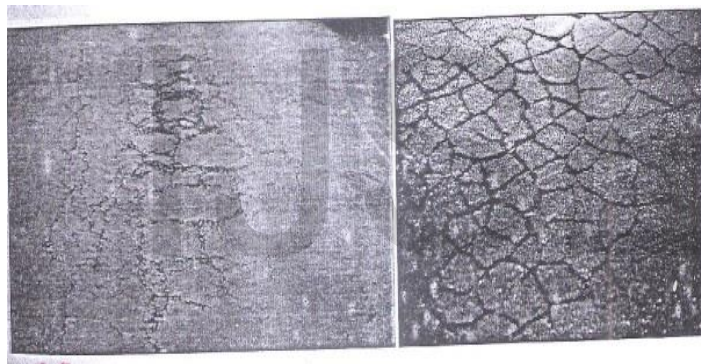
Alligator or Fatigue Cracking in Asphaltic Concrete Pavement, (NCAT, 2008c).
